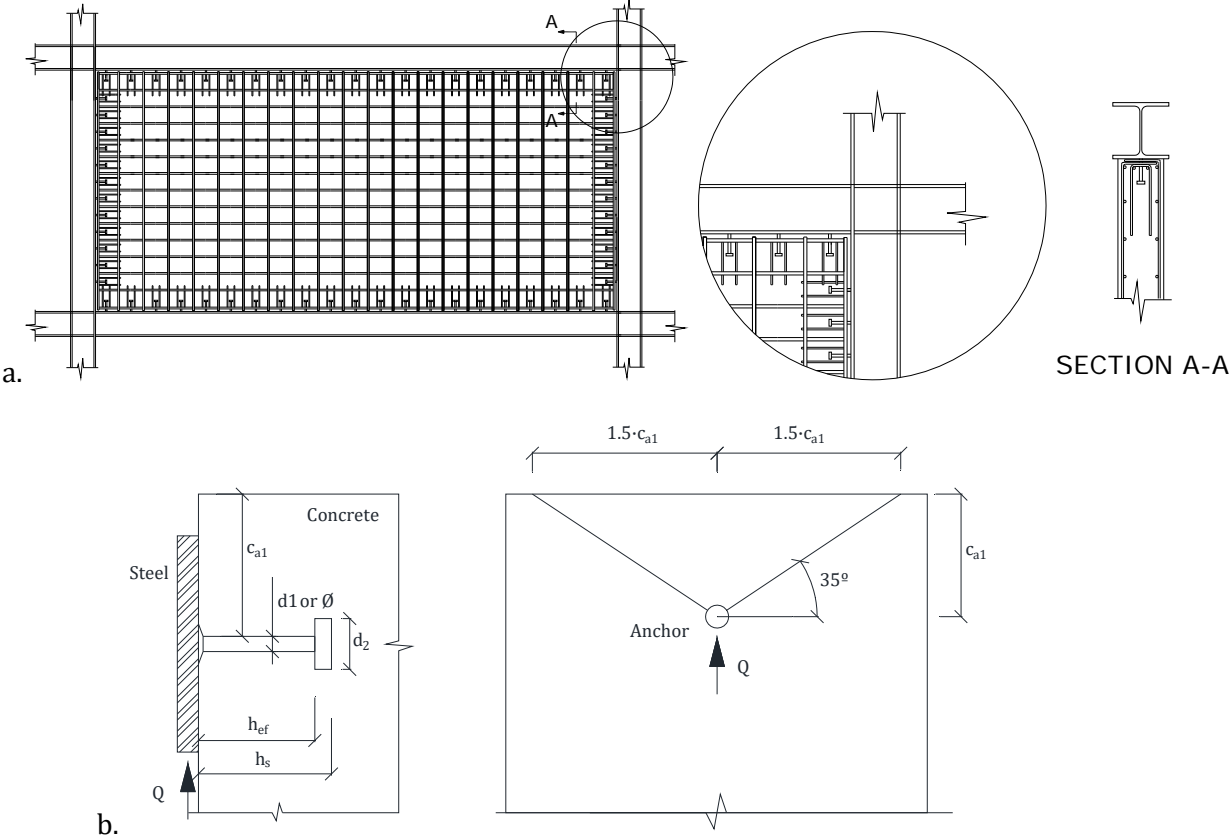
a) Detail of a stud and reinforcement in a composite wall (AISC 360). b) Geometric dimensions of a headed stud and concrete breakout definition.
